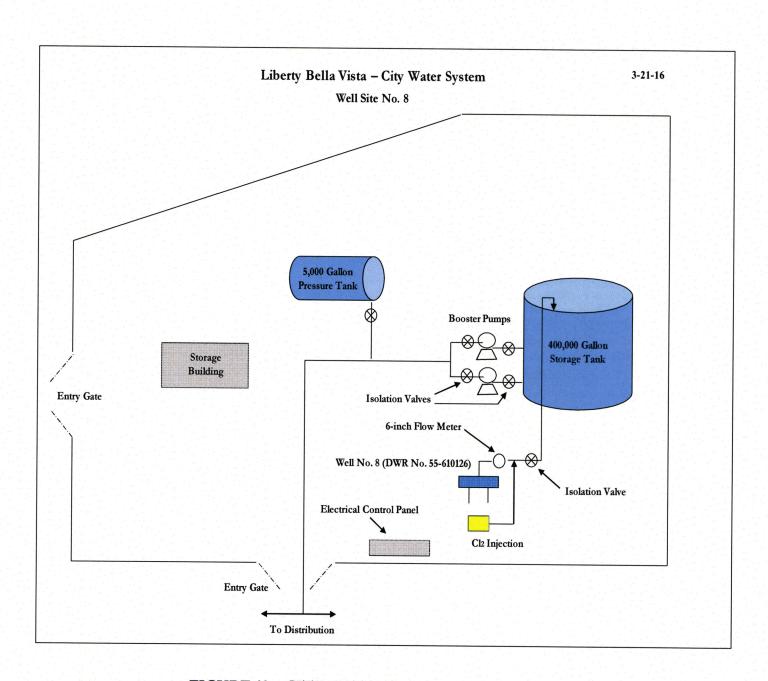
CITY WATER SYSTEM WELL SITE NO. 8
